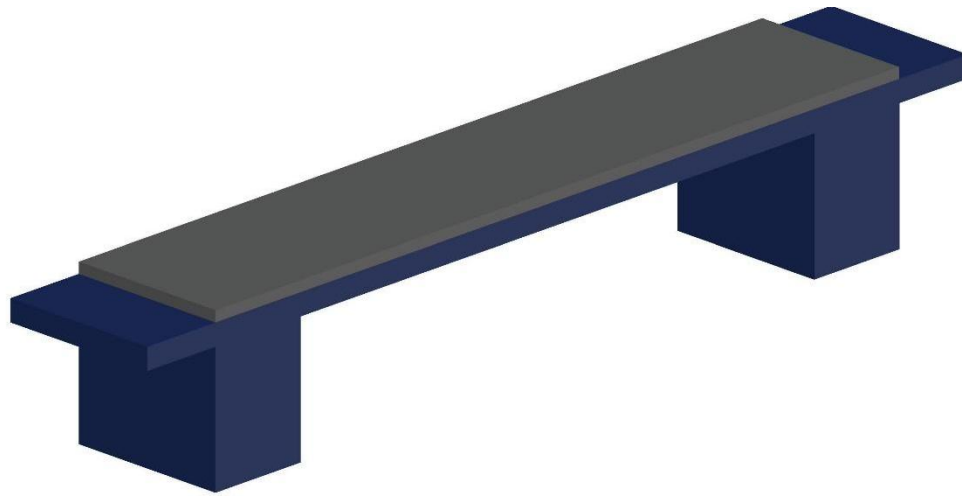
3D Model of First Concept 2 Girders Bridge System
